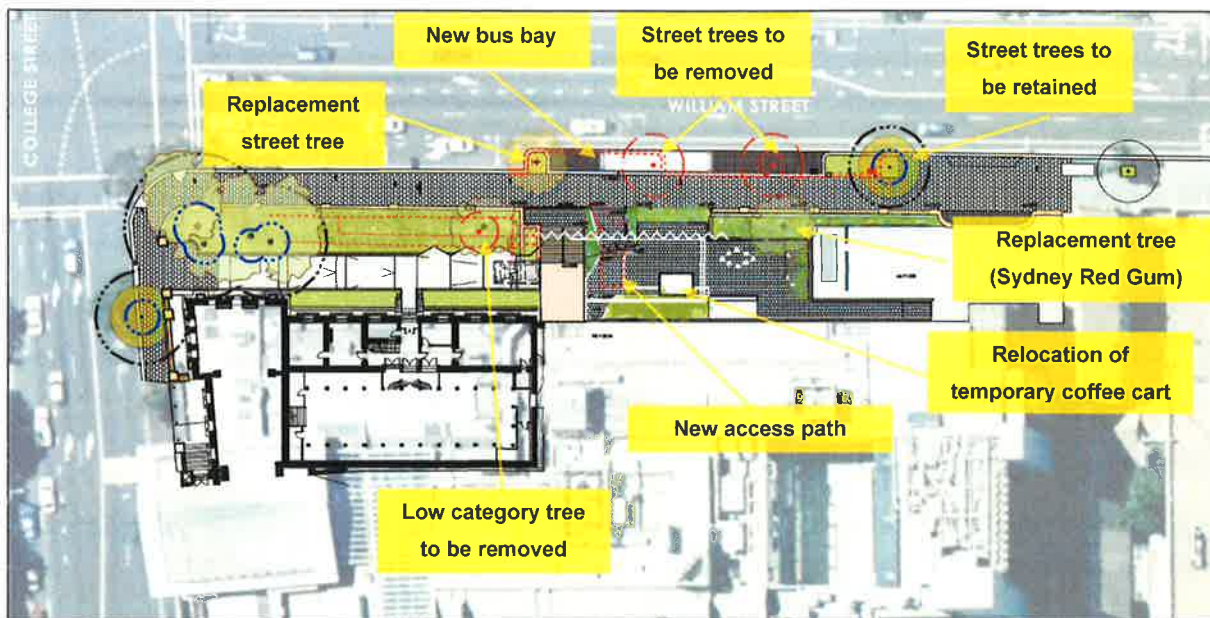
| Landscape concept plan (Source: Applicant's EIS).
